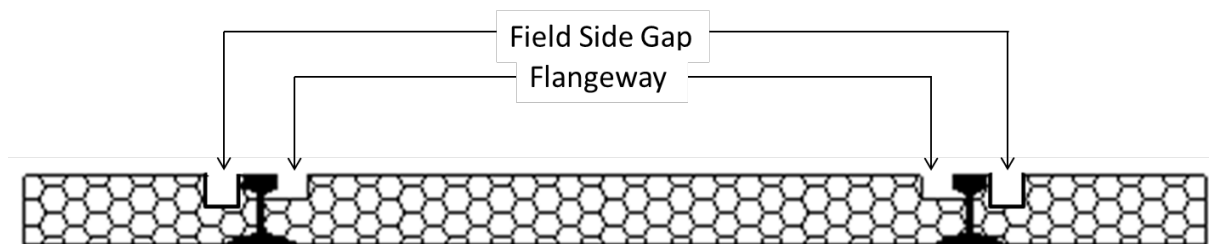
Crossing Surface Section of the Roadway Travelled Way
